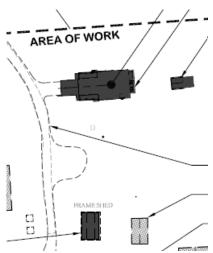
Excerpt from Sheet G01 showing the existing gravel driveway.
